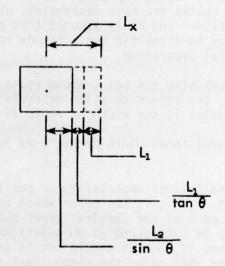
Vertical Cross-Section of Route #2 at Intersection
